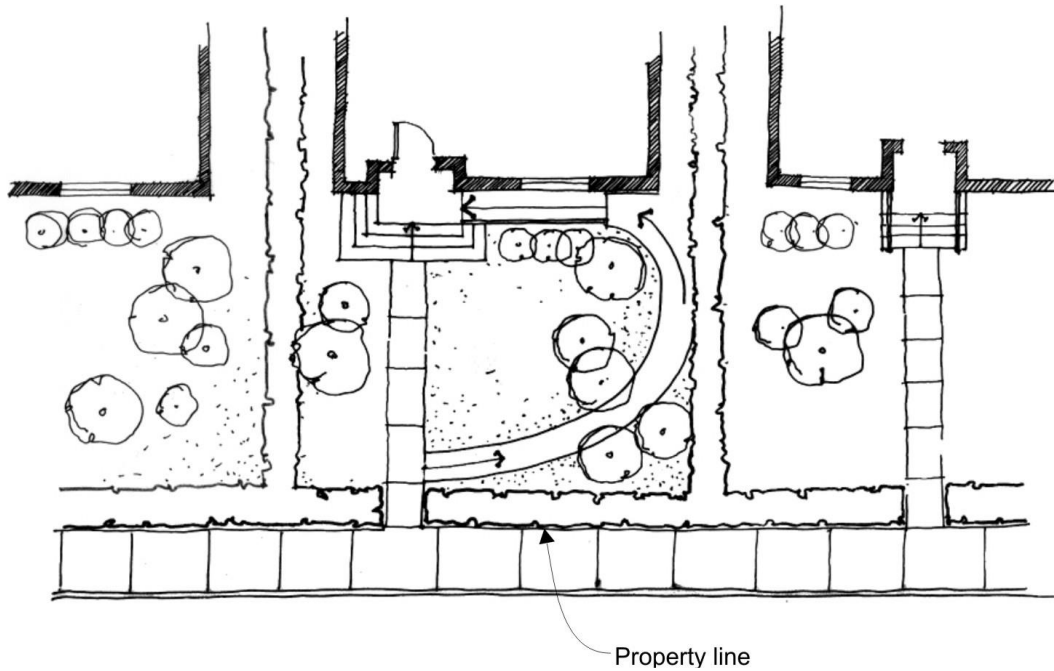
Integrating a Ramp into an Existing Porch - Plan View
